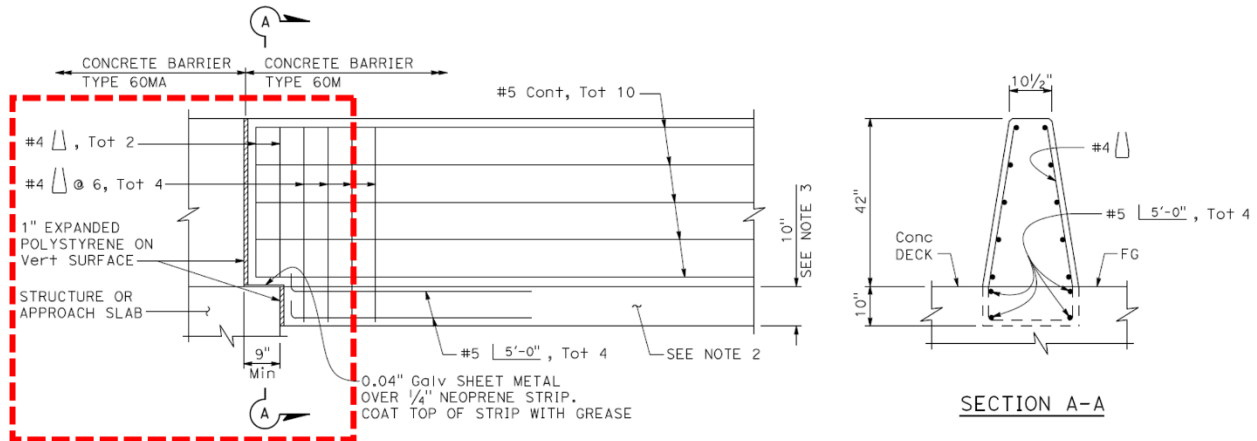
Standard Plan A76AB Showing the Transition Details to Allow for Bridge Movement
